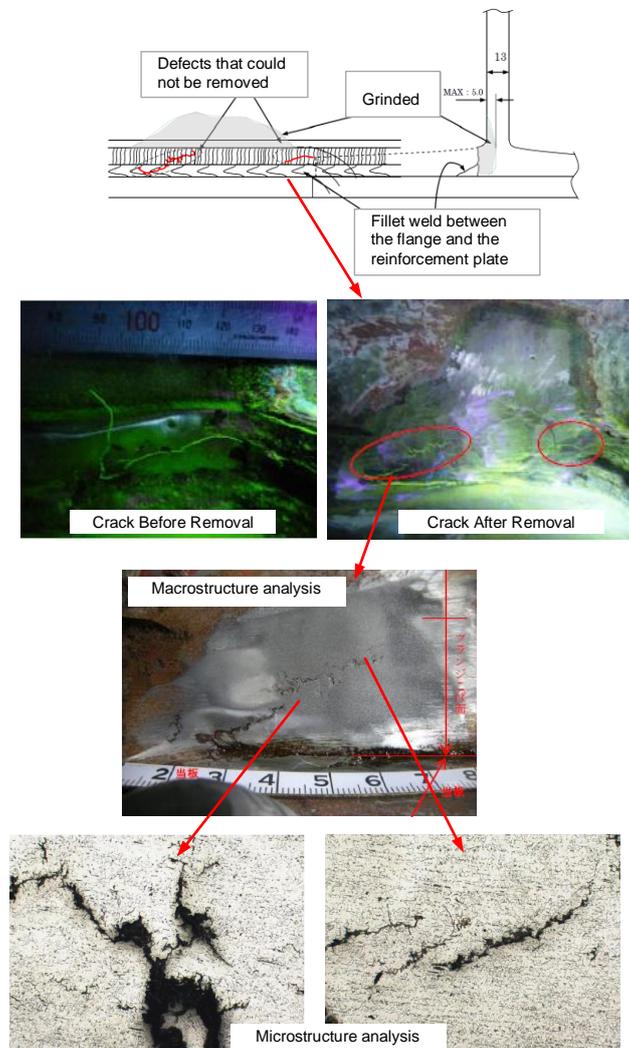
Conditions of the weld at the transverse beam after crack removal
